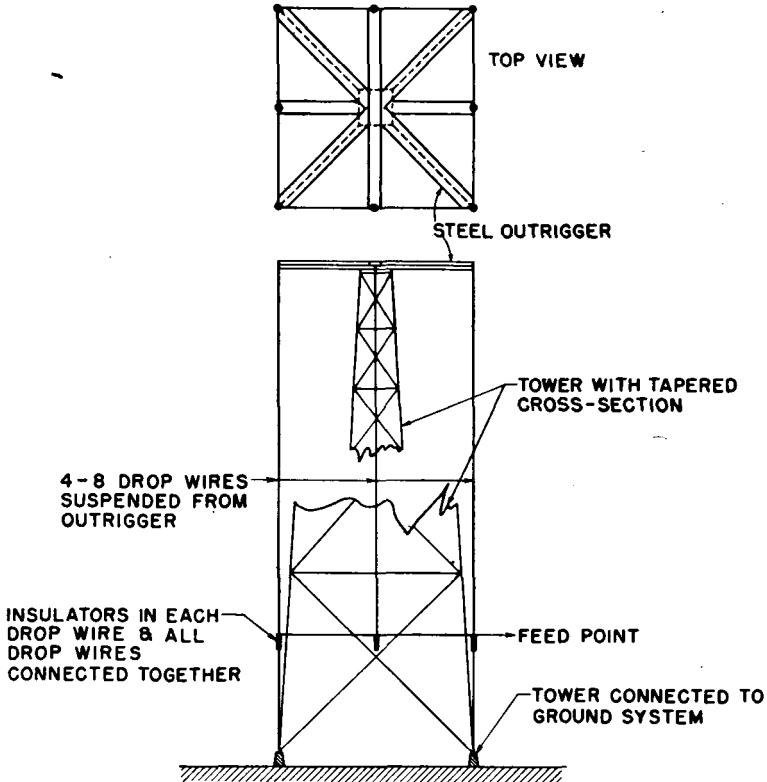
Method of transforming a tapered tower to one of nearly uniform electrical section and using the folded unipole feed.
